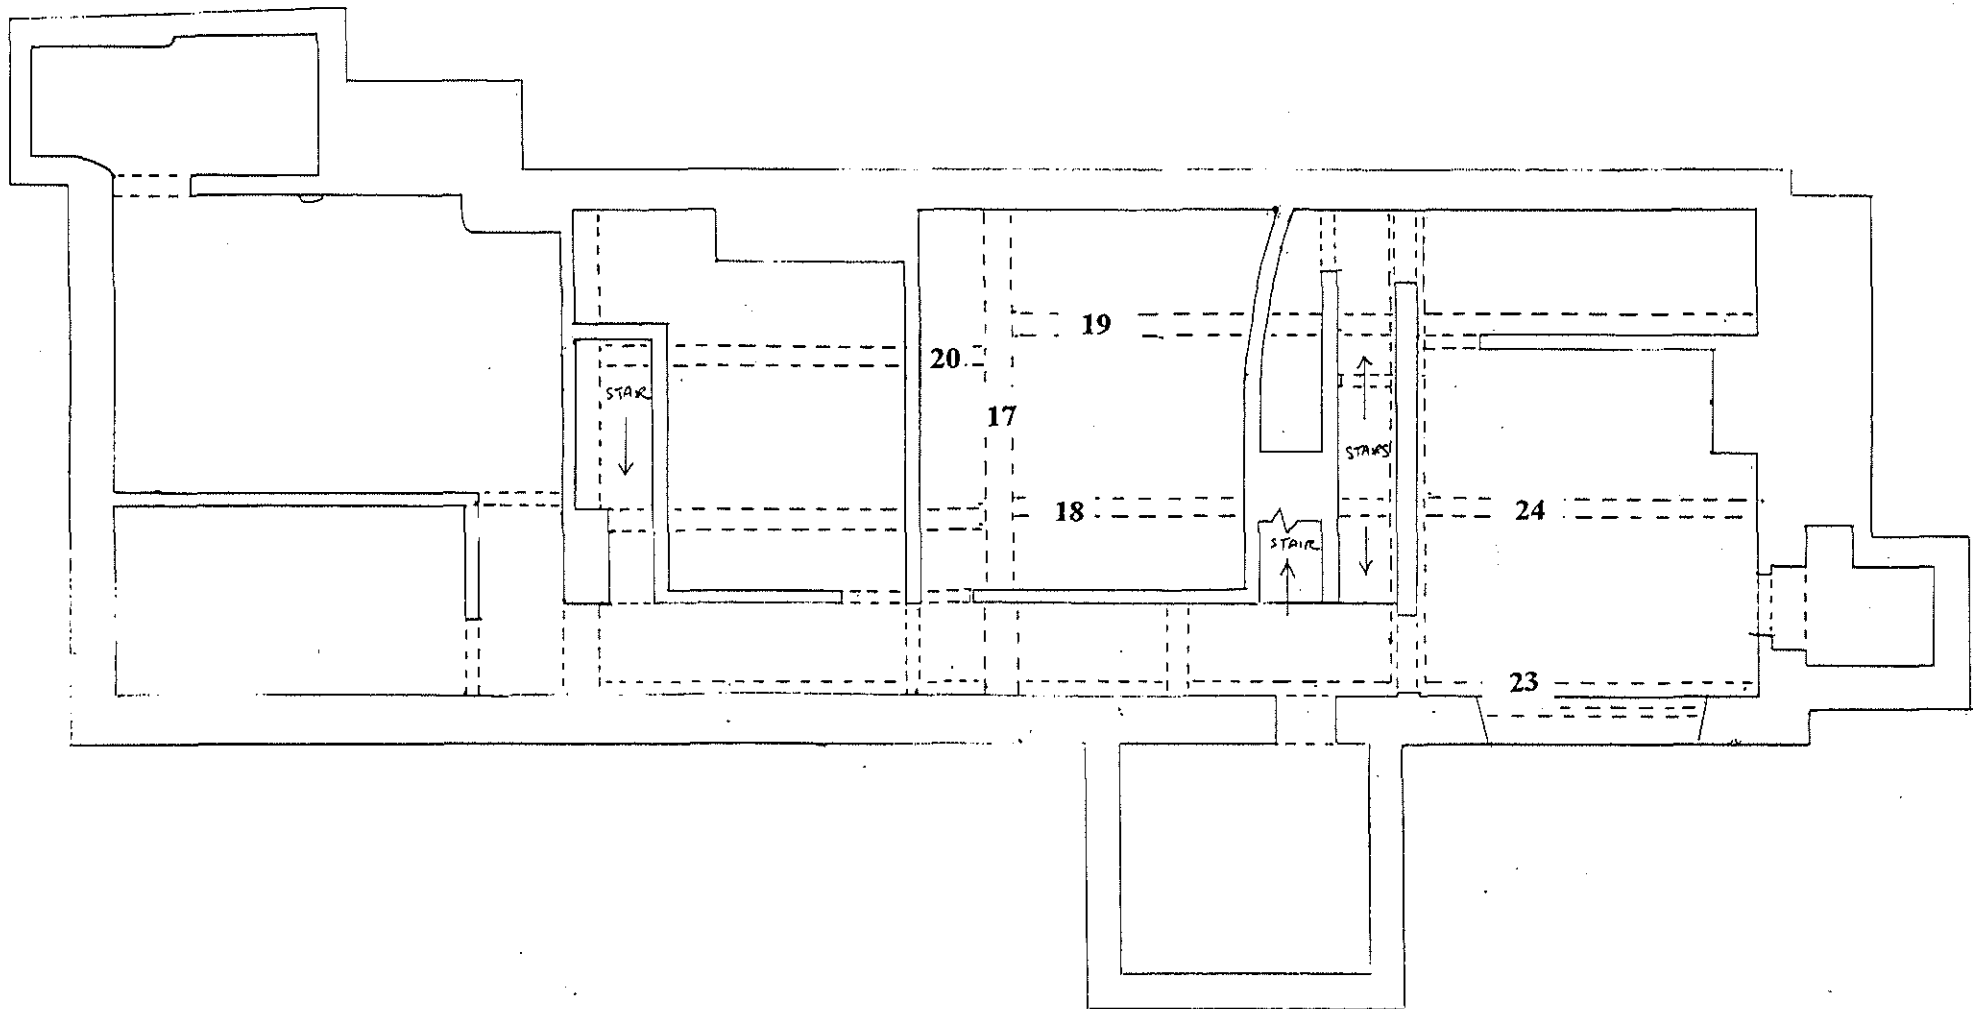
Plan of the ceiling timbers of the ground floor of the farmhouse to show sample locations
